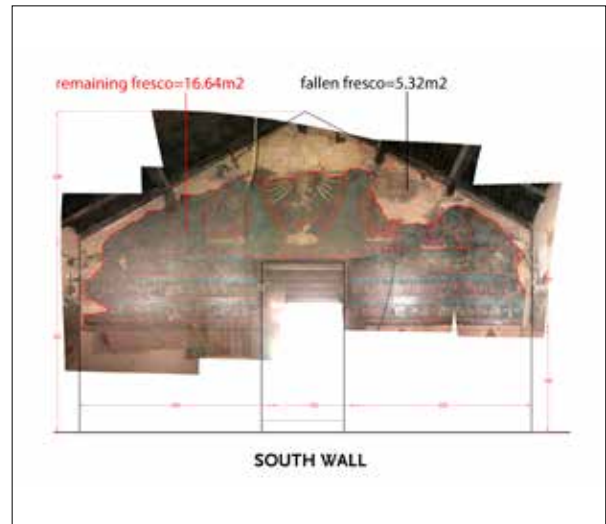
South wall of Śāntipur Temple vestibule's showing the damaged mural paintings © Pierre Gérard Bendele, Ludovic Dusuzeau/UNESCO Kathmandu
